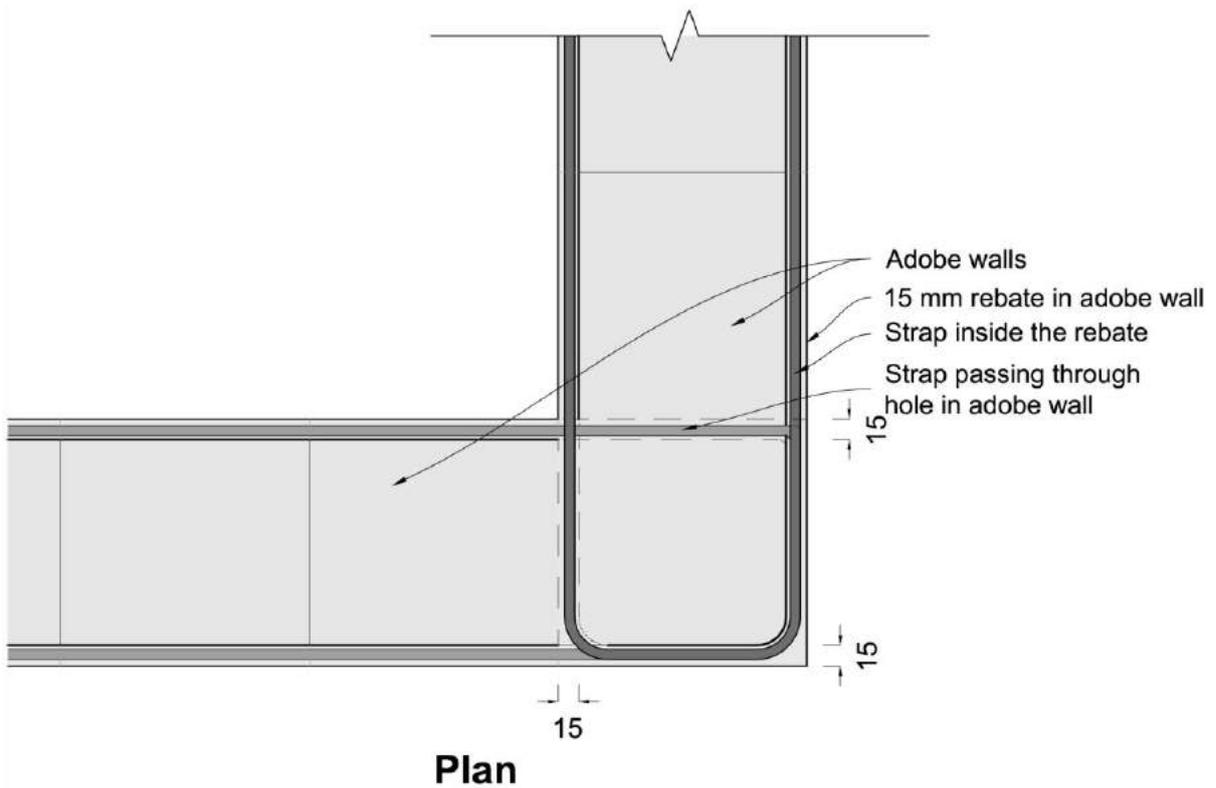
Plan view of a layer of two horizontal straps at an exterior corner. Note that because horizontal straps are applied after the vertical straps, their rebate is shallower (15 mm).
